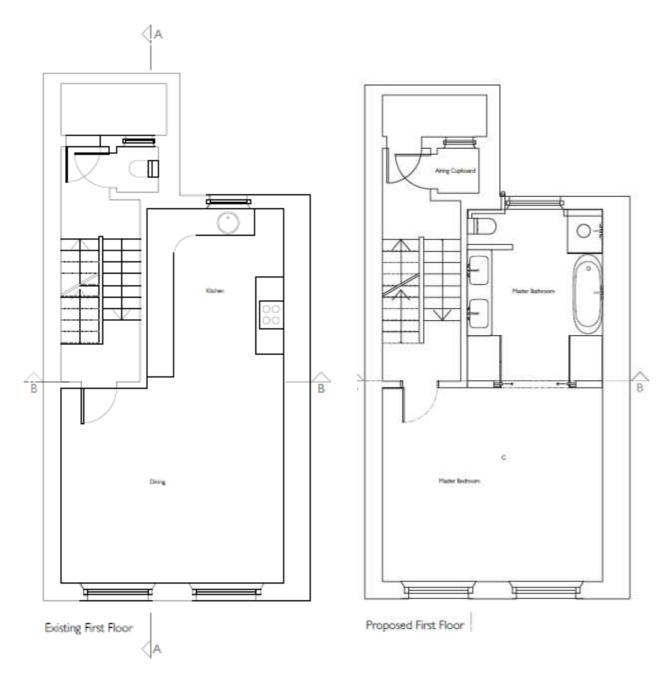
The existing (left) and proposed (right) first floor plans of 5 Sharpleshall Street (2013/7037/P and 2013/7086/L) show that the chimney breasts and dividing walls between the front and rear rooms have been removed.
